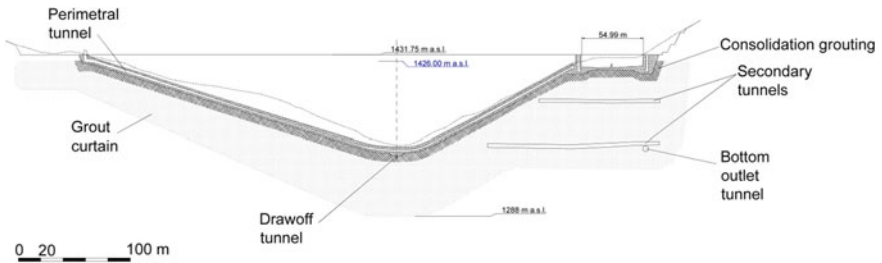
Menta Dam—longitudinal section of the dam, indicating the grout curtain and the inner perimeter tunnel
